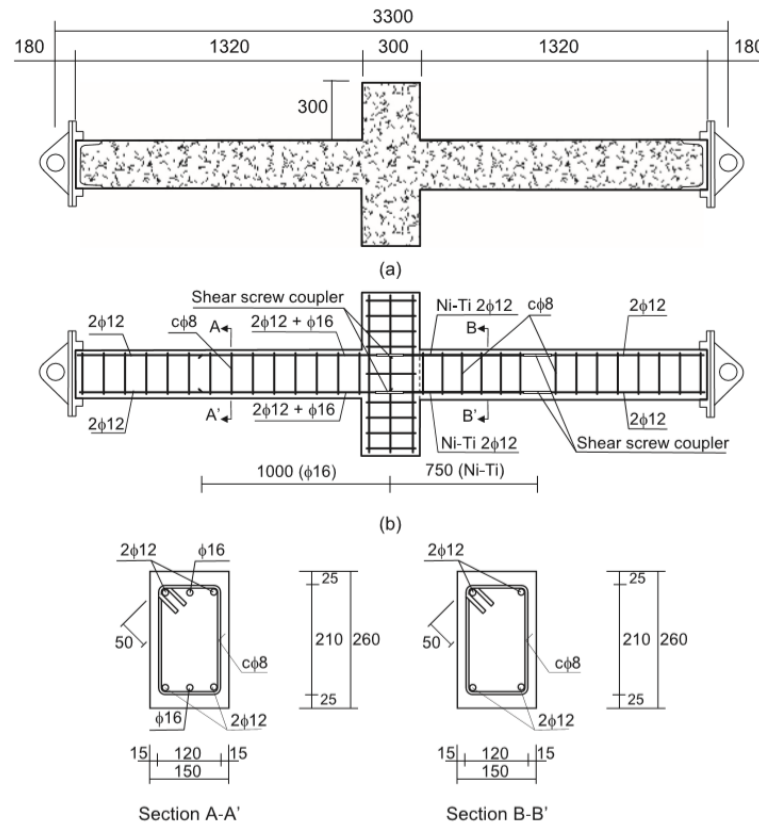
Beam column specimen dimensions and detailing (Pereiro-Barceló et al., 2018).
